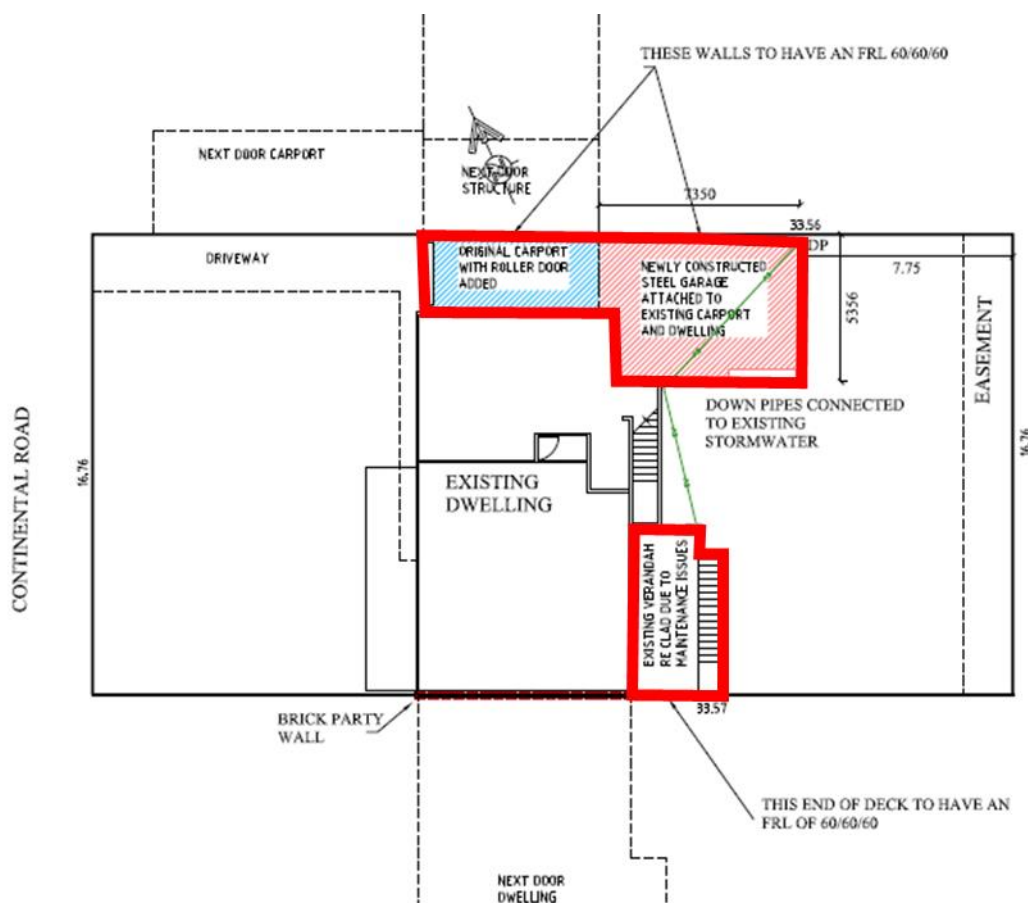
Screenshot of the proposed site plan showing the location of unapproved structures (red outline added) – submitted with the subject planning permit application
